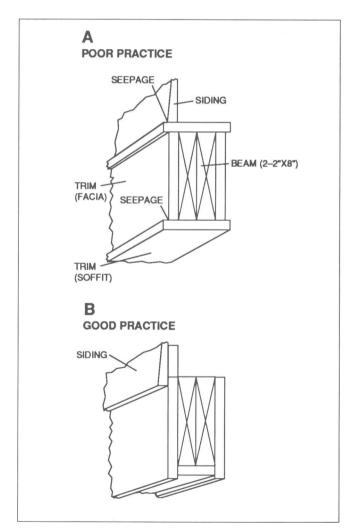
Boxed beam (A) has horizontal ledge that traps rain water. Boxed beam (B) illustrates good construction; boxed similarly to the standard eave, it is less subject to rain seepage because it does not have the rain-trapping ledge.
